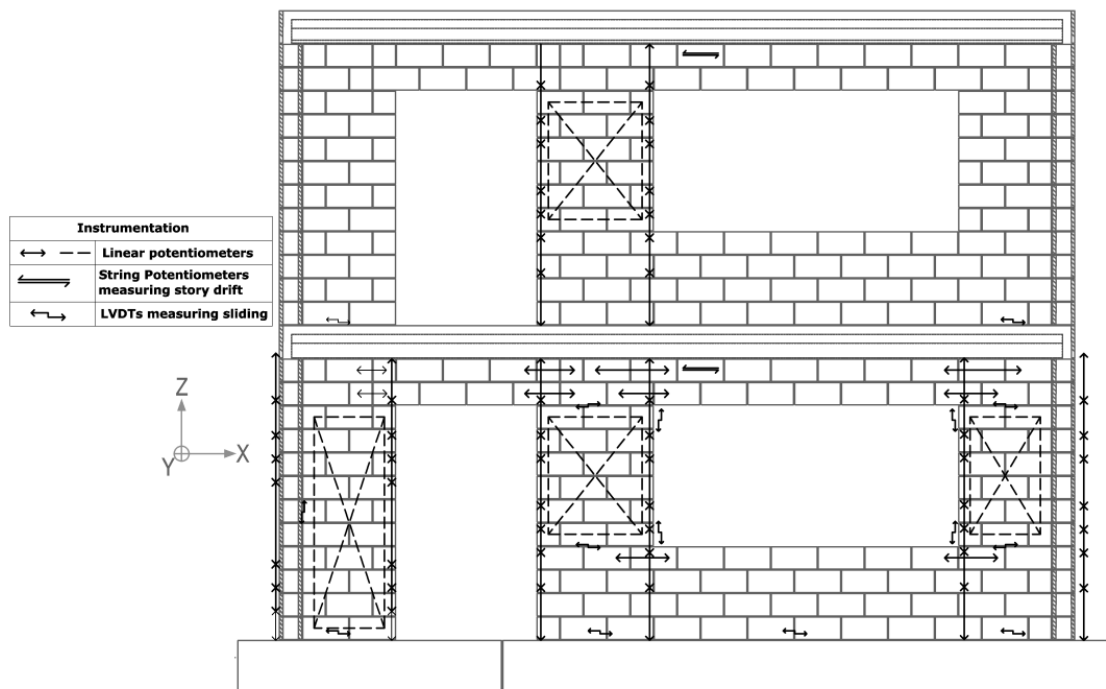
Locations of linear and string potentiometers on the interior wall.
